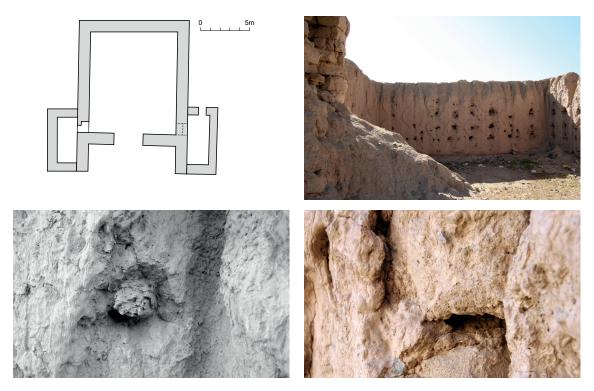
(Top, left) Basgo. Lhakhang. Ground plan.
